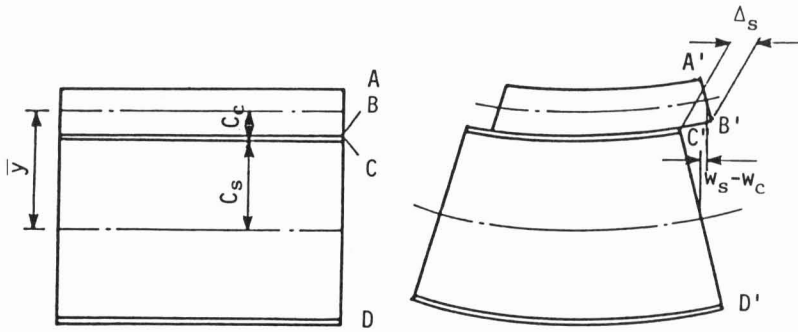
Slip Configuration between the Concrete Slab and Steel Beam.
